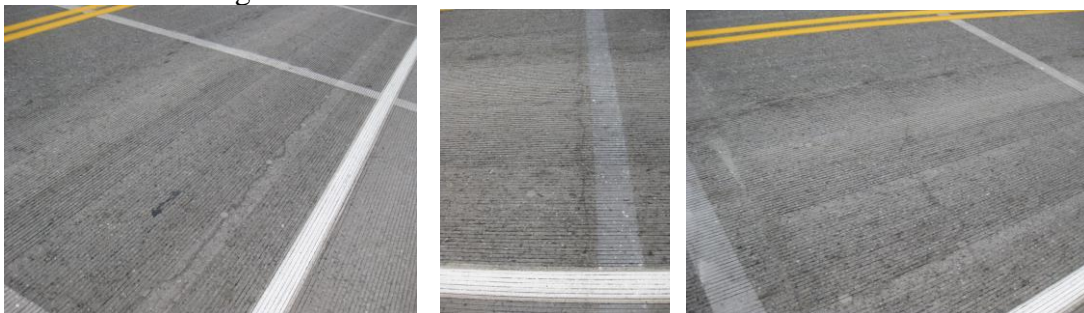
Multiple cracking longitudinal, beside and parallel to UHPC connections
